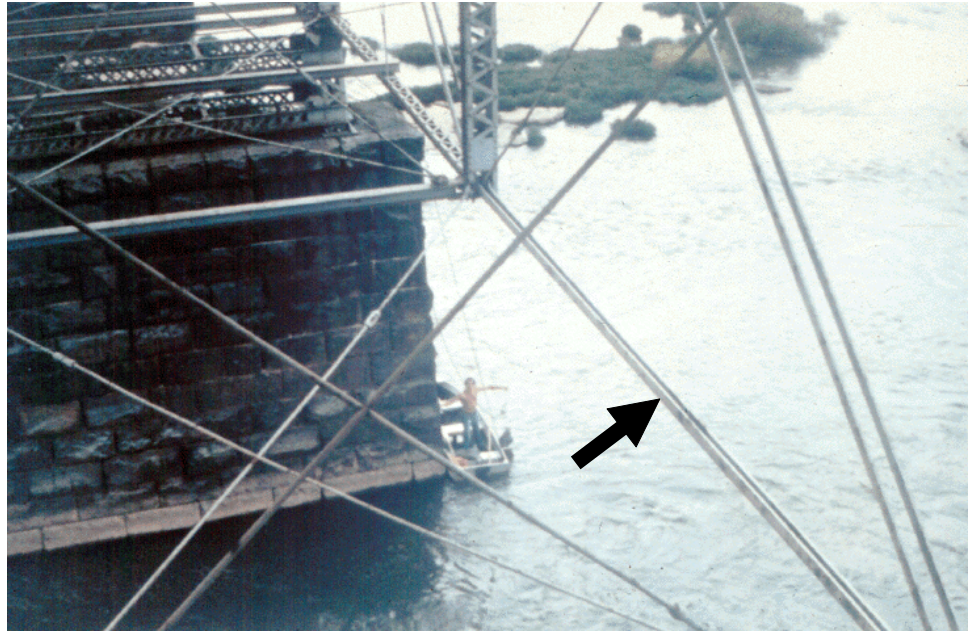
Fracture Critical Bottom Chord Truss Member: Internally Non-redundant Eyebars
